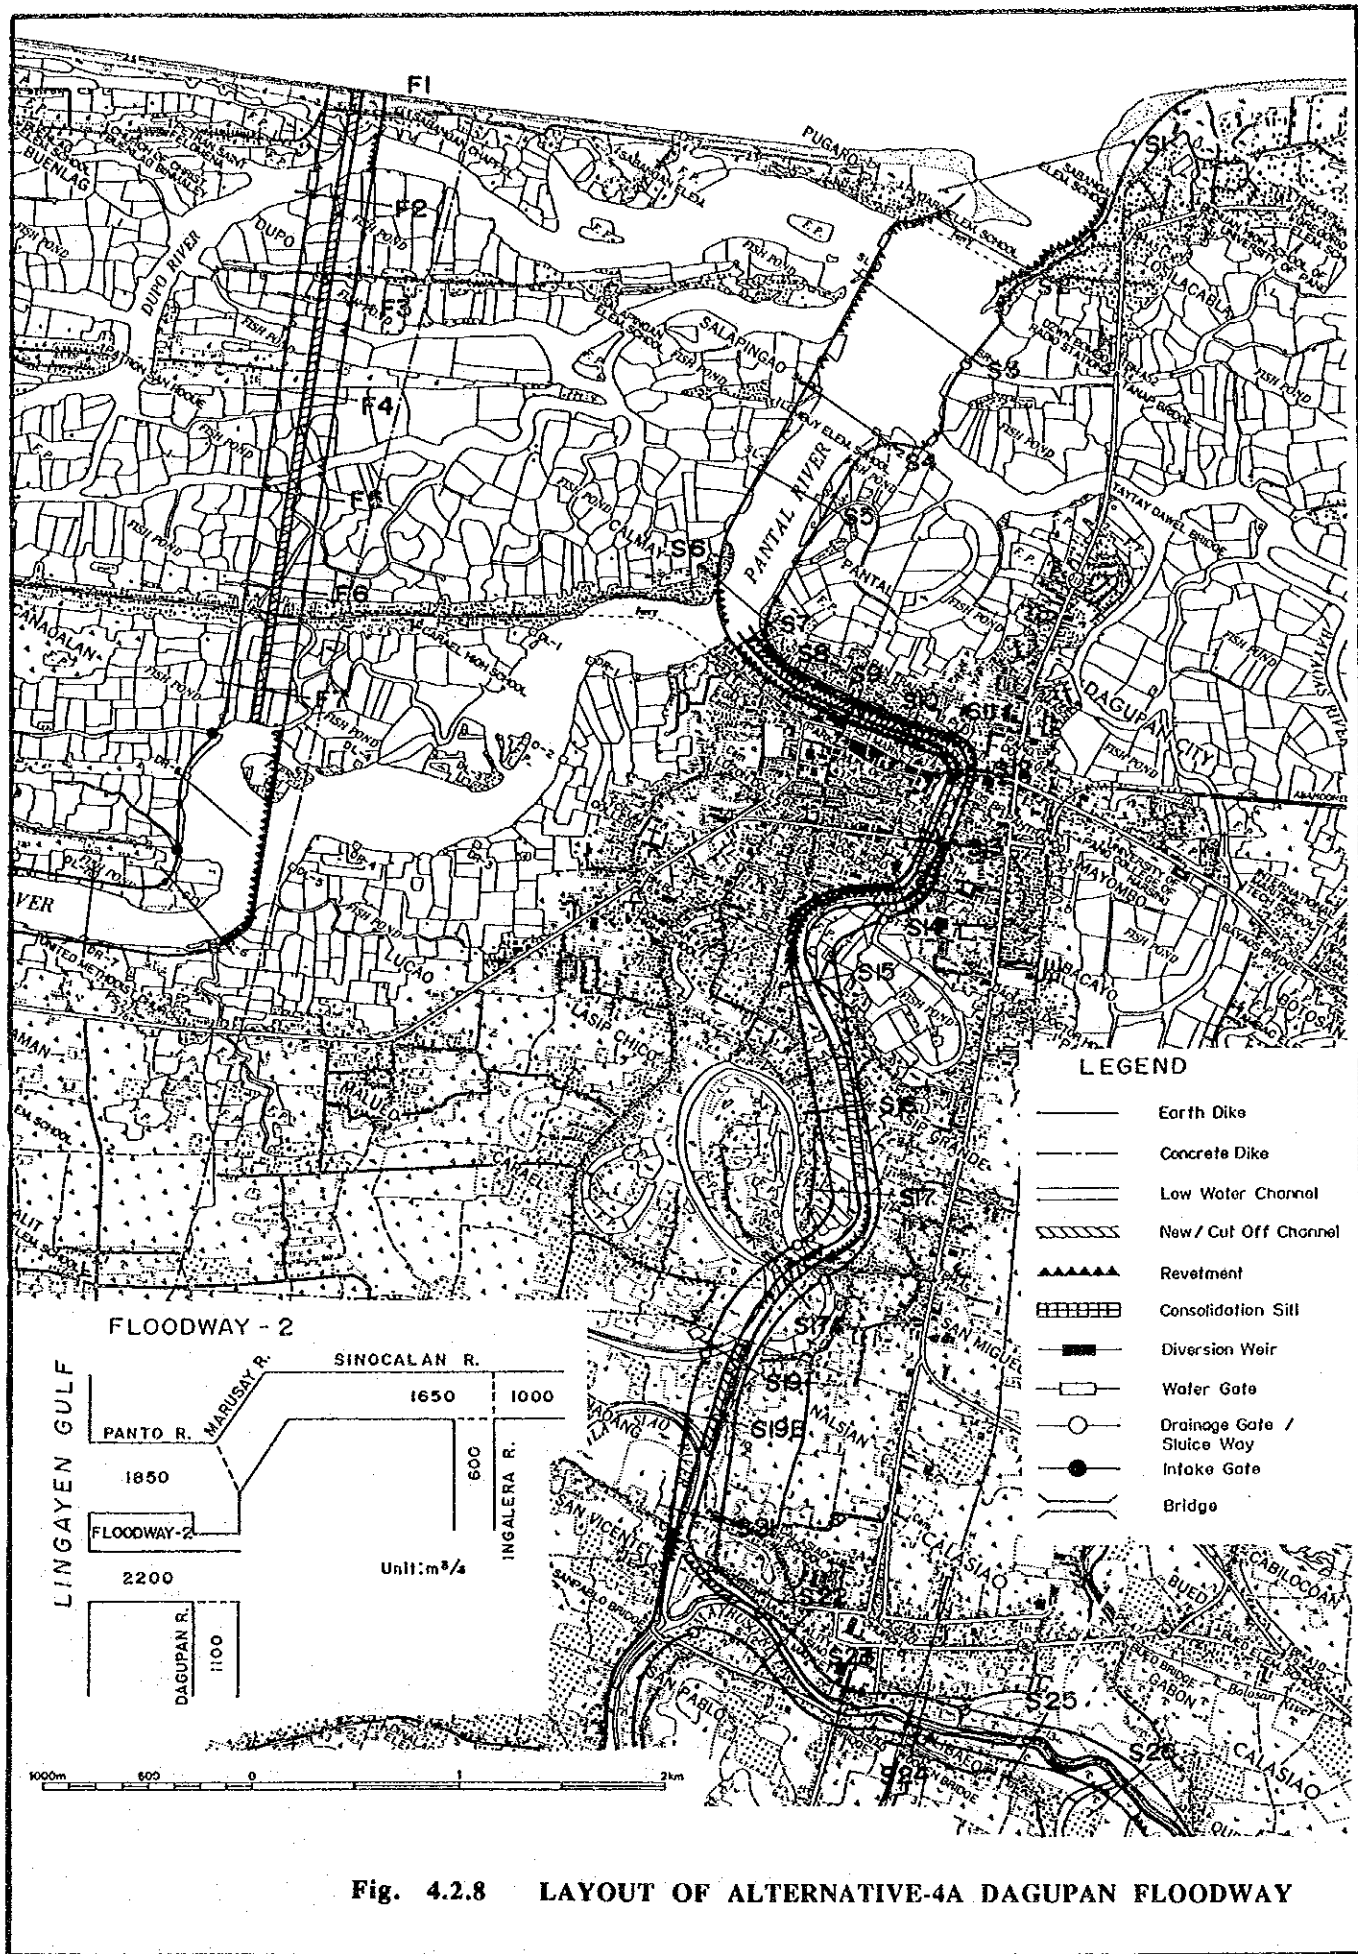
LAYOUT OF ALTERNATIVE-4A DAGUPAN FLOODWAY
